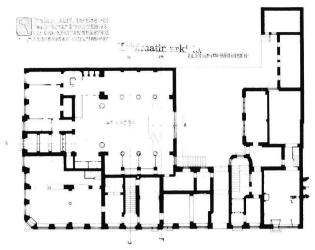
The building at North Esplanade 19 — Unioninkatu 28, Helsinki, where the premises of the Privatbanken (1903–04) were located. Ground floor plan, 1903. The entrance is on the left, followed by the passage, the entry hall and the banking hall. The secondary Unioninkatu entrance and stairway are below in the drawing. On the exterior, see Fig. 7. (HKRVVA).
